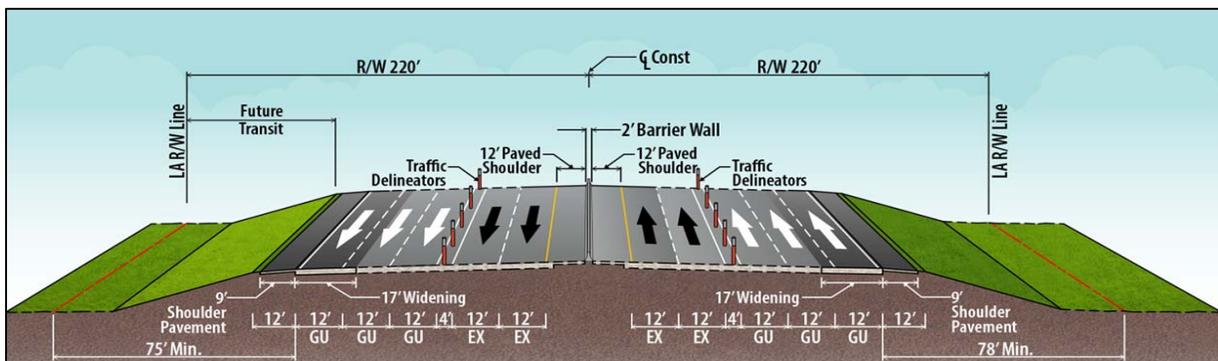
I-275 Preferred Mainline Master Plan Build Alternative Typical Section from south of Gandy Boulevard to Roosevelt Boulevard (Segment C-MP1)
